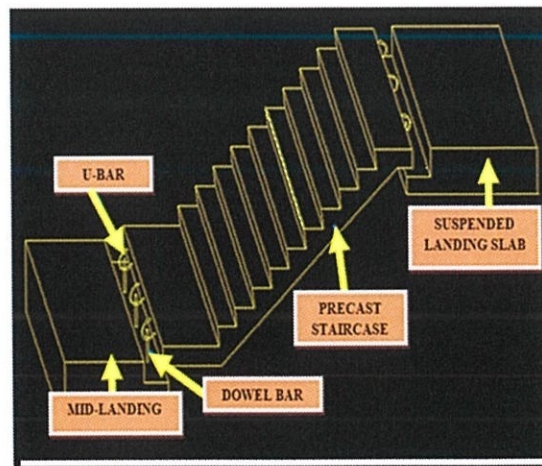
illustration of precast concrete staircase to the mid-landing and suspended landing slab
